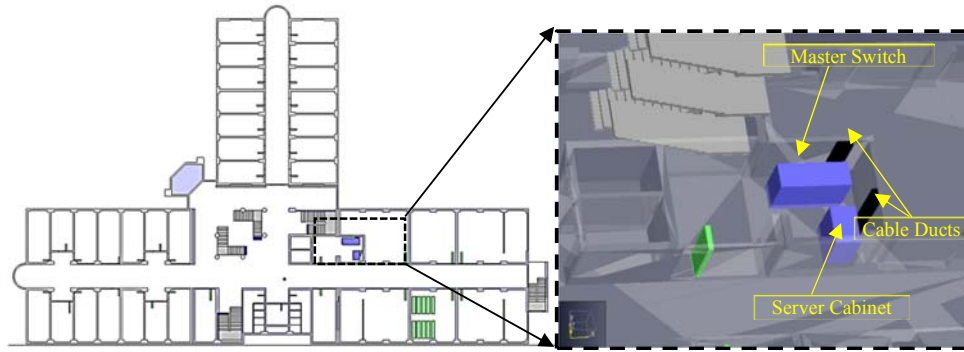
Switchgear room location at the basement floor with a 3D model of the master switch cabin, server cabinet, and cable ducts.
